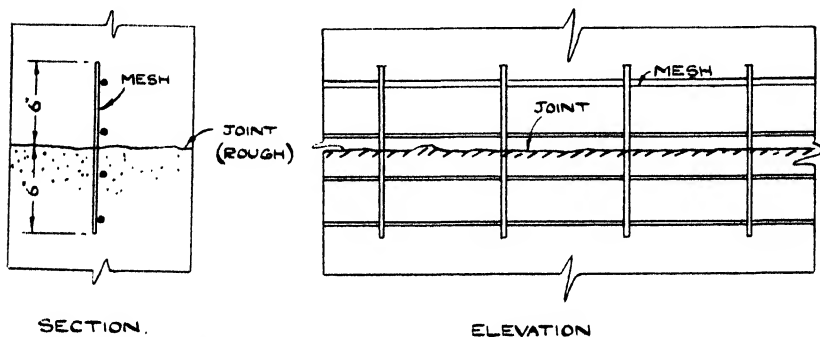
PRECAUTION AT END OF DAY'S CONCRETING FOR WATERPROOF CONCRETE
